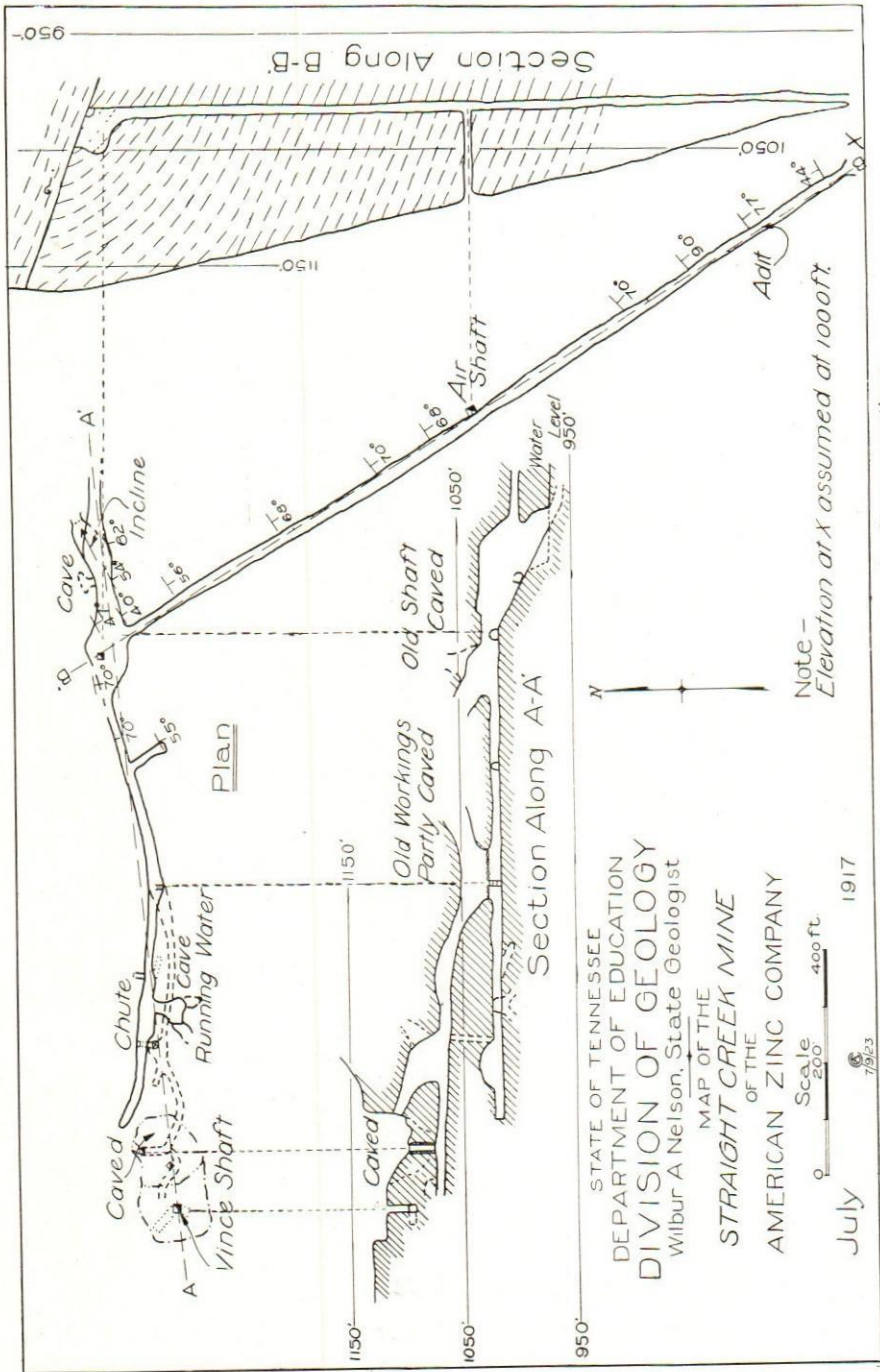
Plan of Straight Creek mine, showing cross sections.
